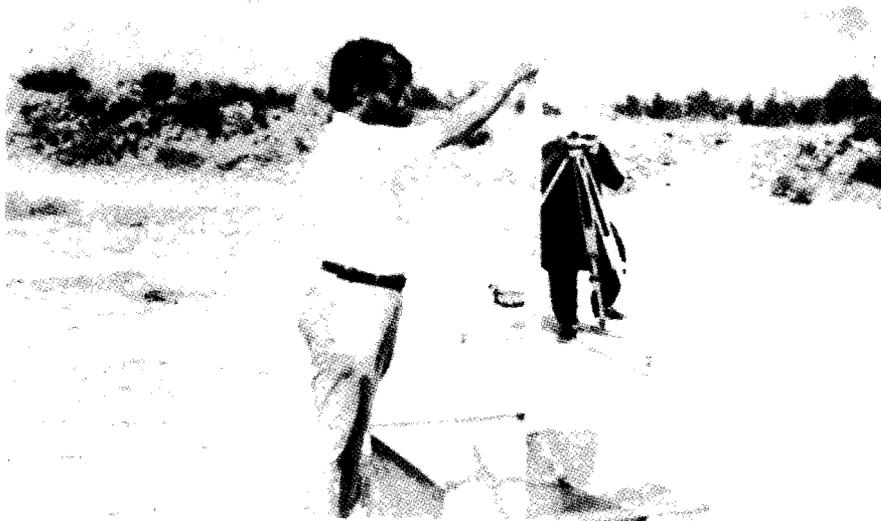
Establishing an assumed elevation for the floor of the Cutthroat Flume lying on bare ground.
